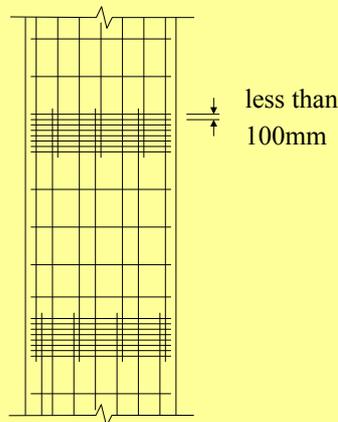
Spacing between ties, intermediate ties and hoops at lap splices
